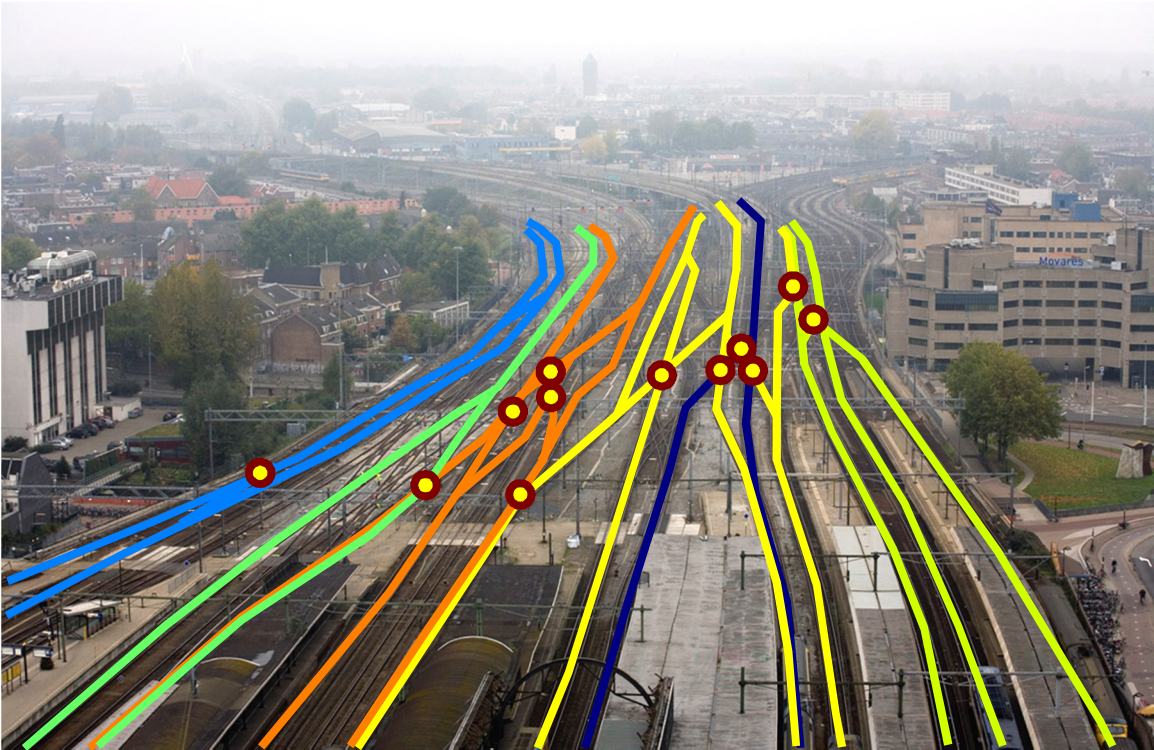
Utrecht station before improvements (Kraaijeveld, 2009)
